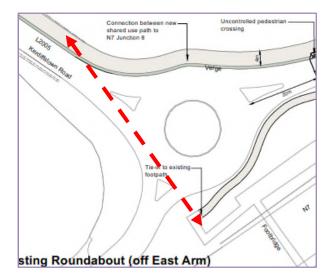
EW5604-00-030 Rev O, New Site Access Proposed Pedestrian Access and Cycleway & Site Observation.
